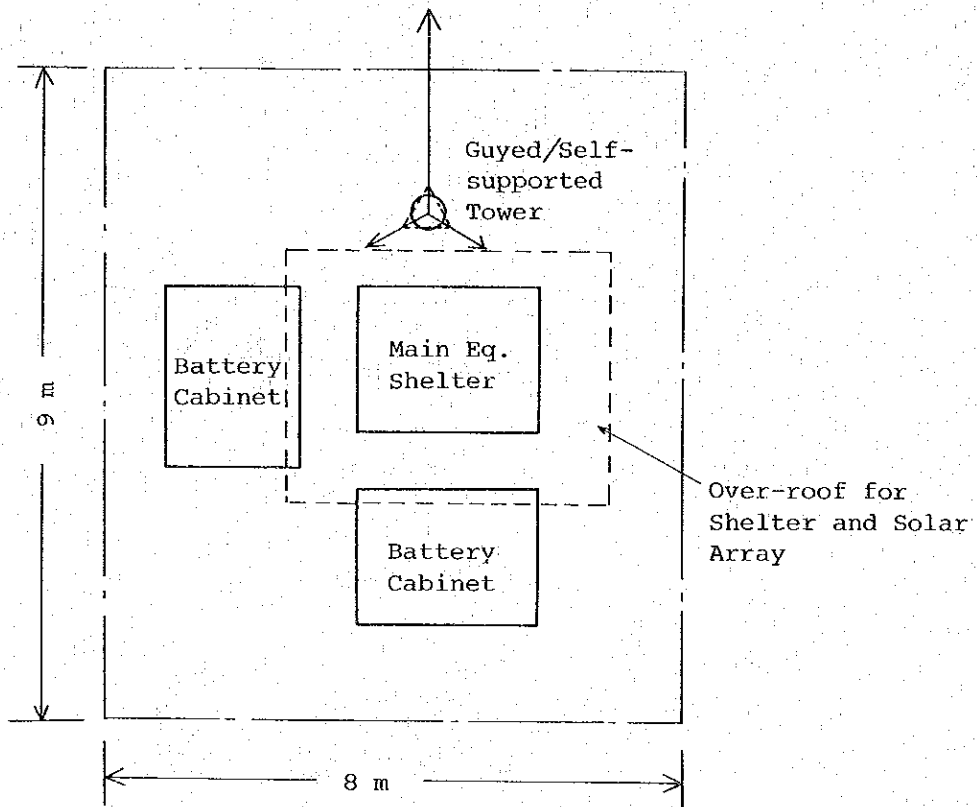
(5/5) Typical Site Layout Plan for Repeater Station with Solar Power System and Guyed/self-supported Antenna Tower
